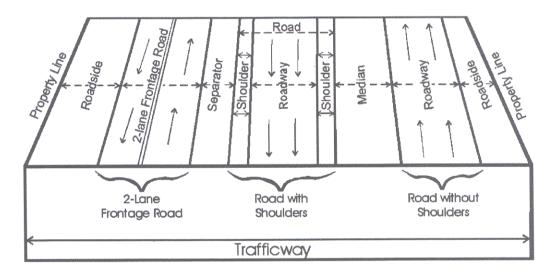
Trafficway with Frontage Road (See 2.2.30)
